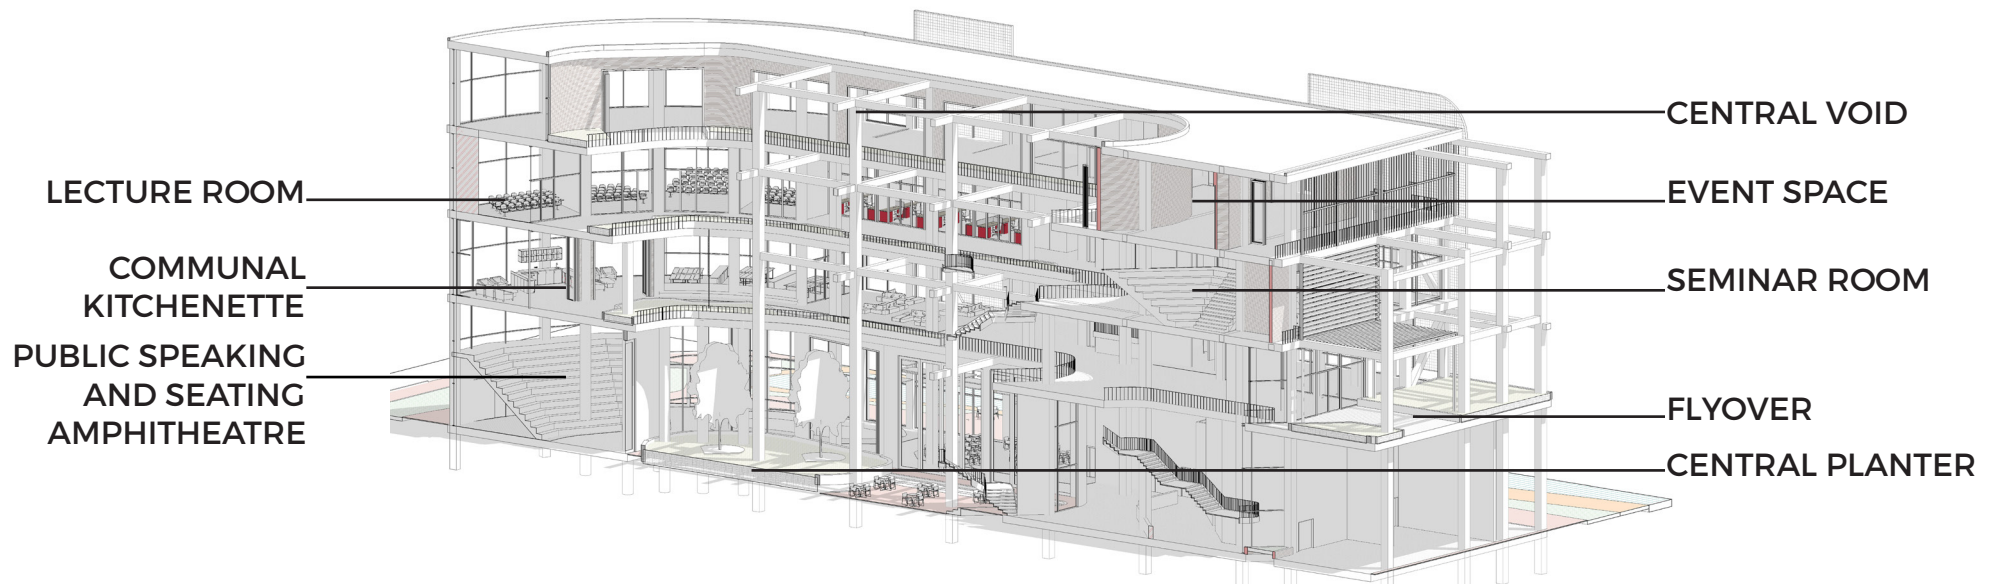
STRIP SECTION DATA CENTRE (AUTHOR 2021)
